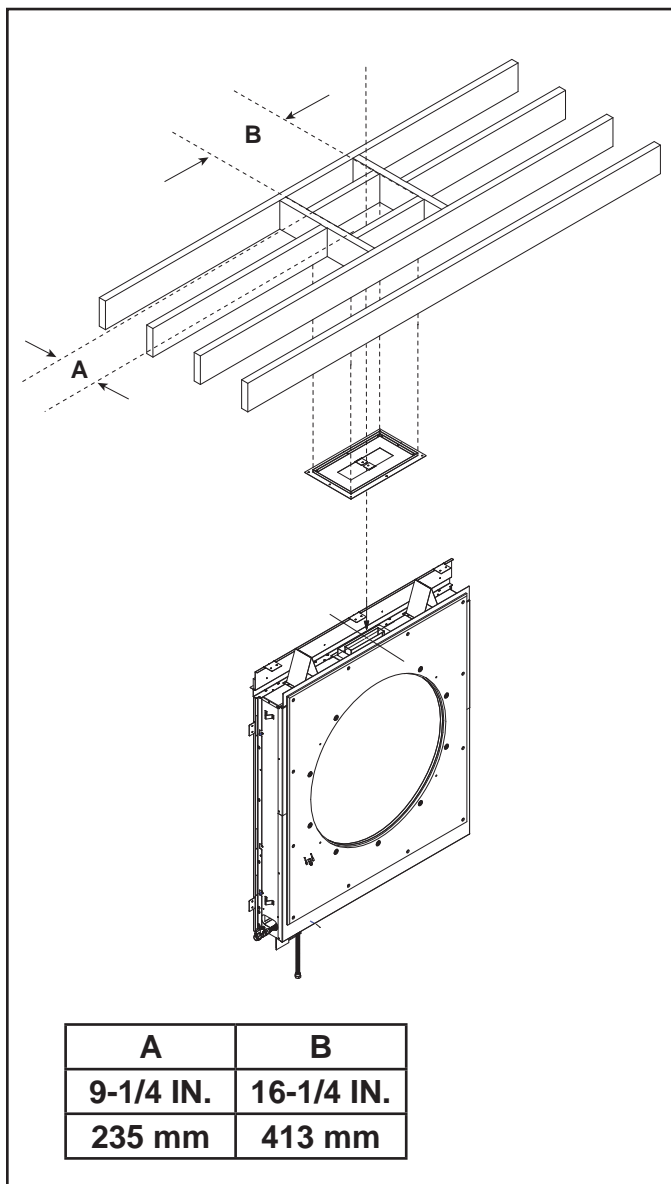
Installing DVRP-WFS Ceiling Firestop
